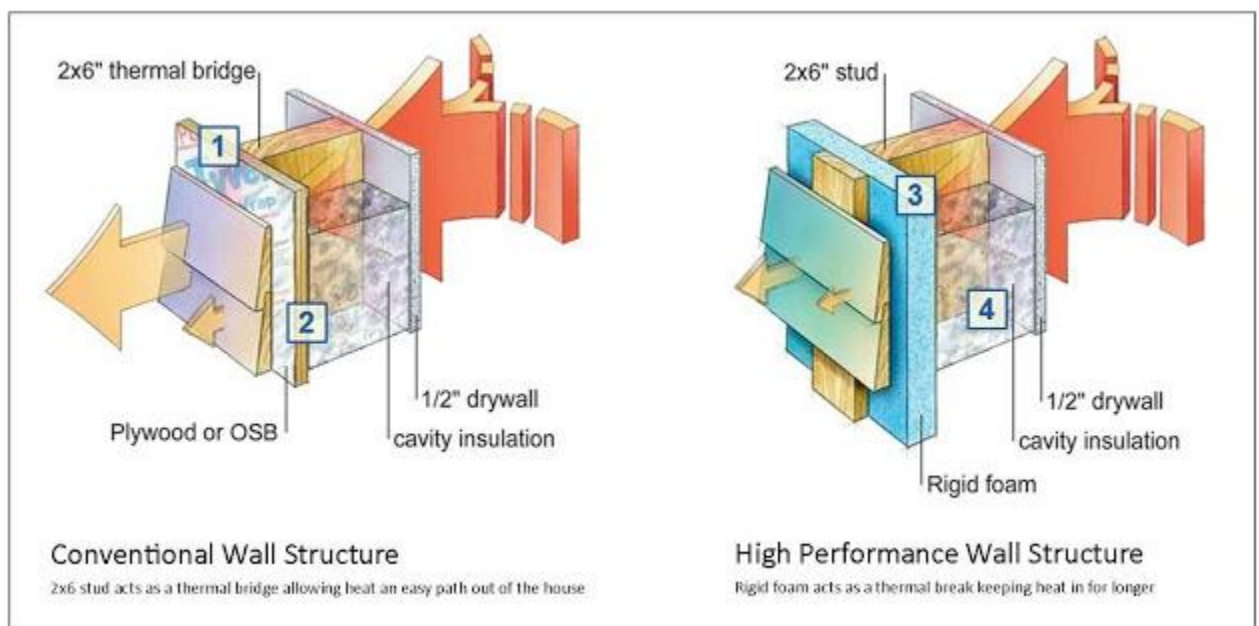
Left: Conventional wall structure with a thermal bridge. Right: High performance wall structure with a thermal brake. (Mcgar, 2014).
